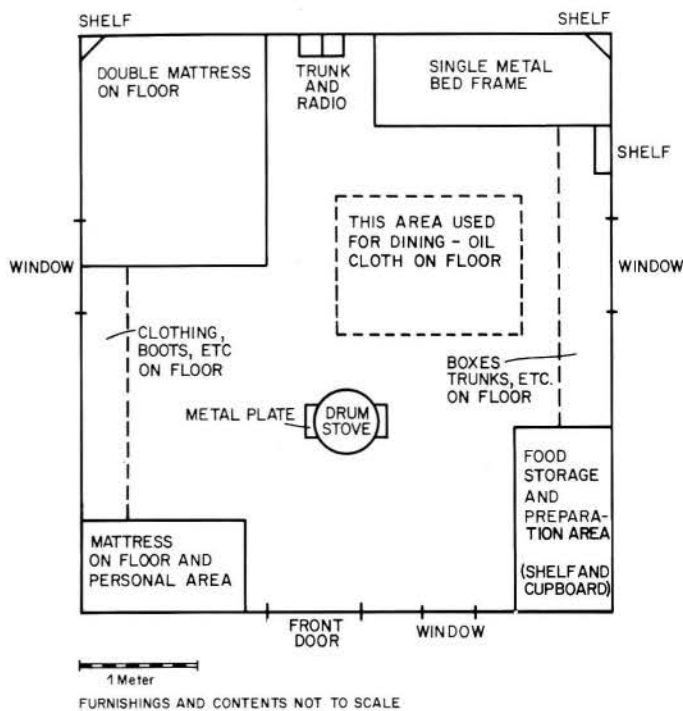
Cabin floor plan of household 6, recorded on 27 April, 1975. Eight people were occupying the cabin.
